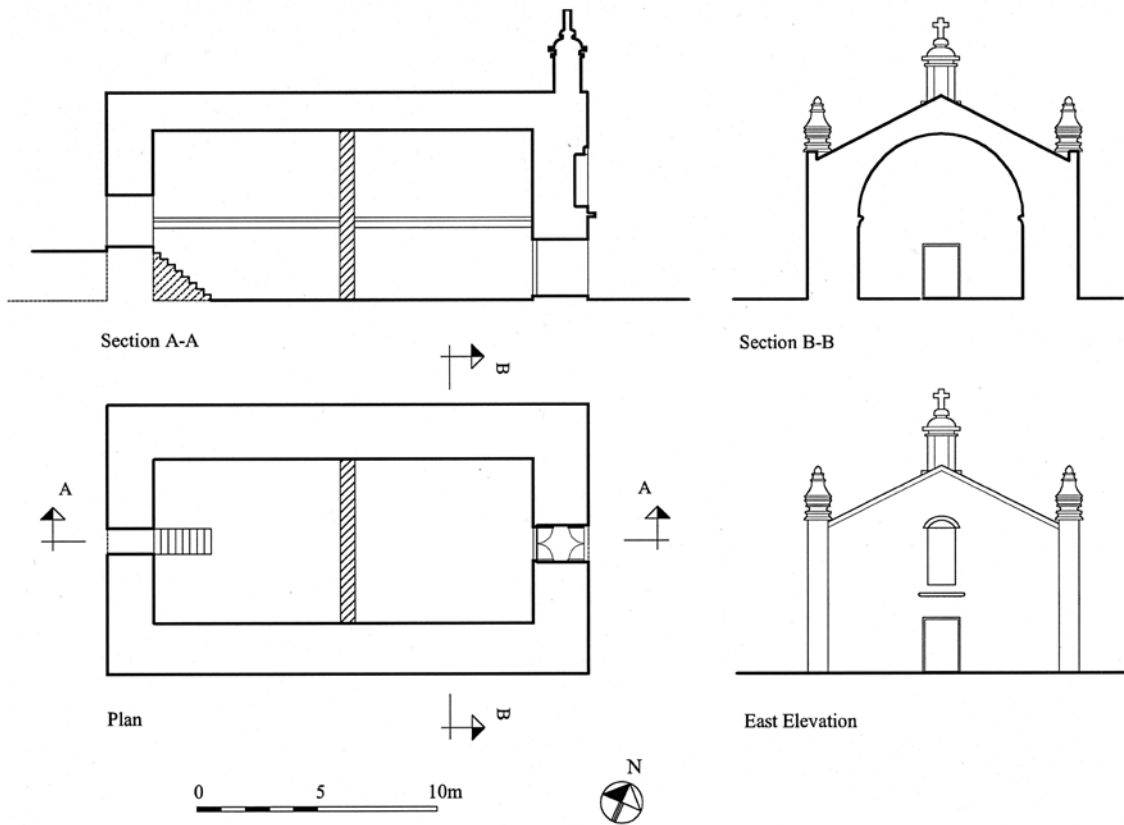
Powder magazine (24), plan, longitudinal section A-A, transverse section B-B showing the vaulted roof and east elevation which resembles that of a chapel. The thickness of the walls and the vault is noticeable.
